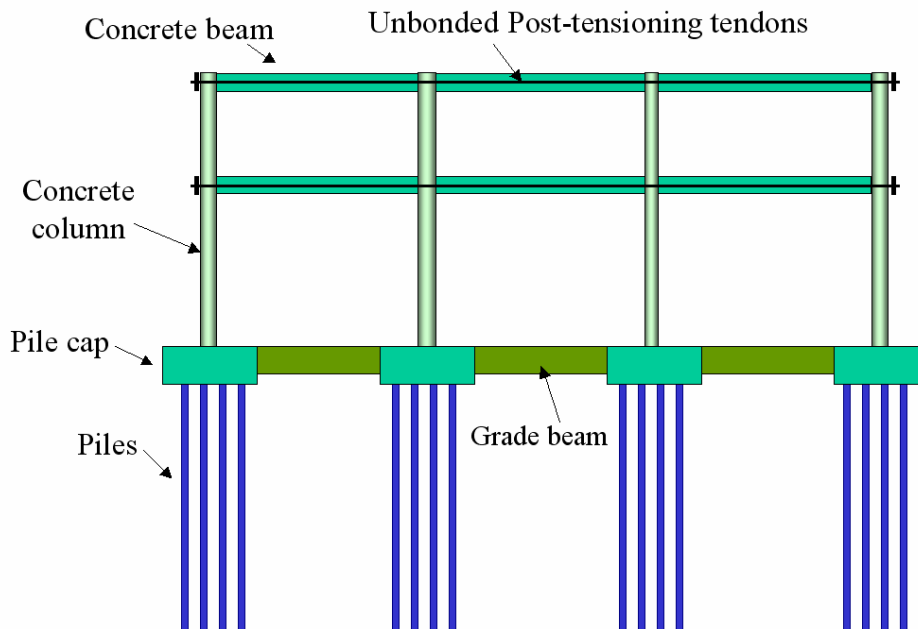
Typical Post-tensioning Concrete Frame Elevation
